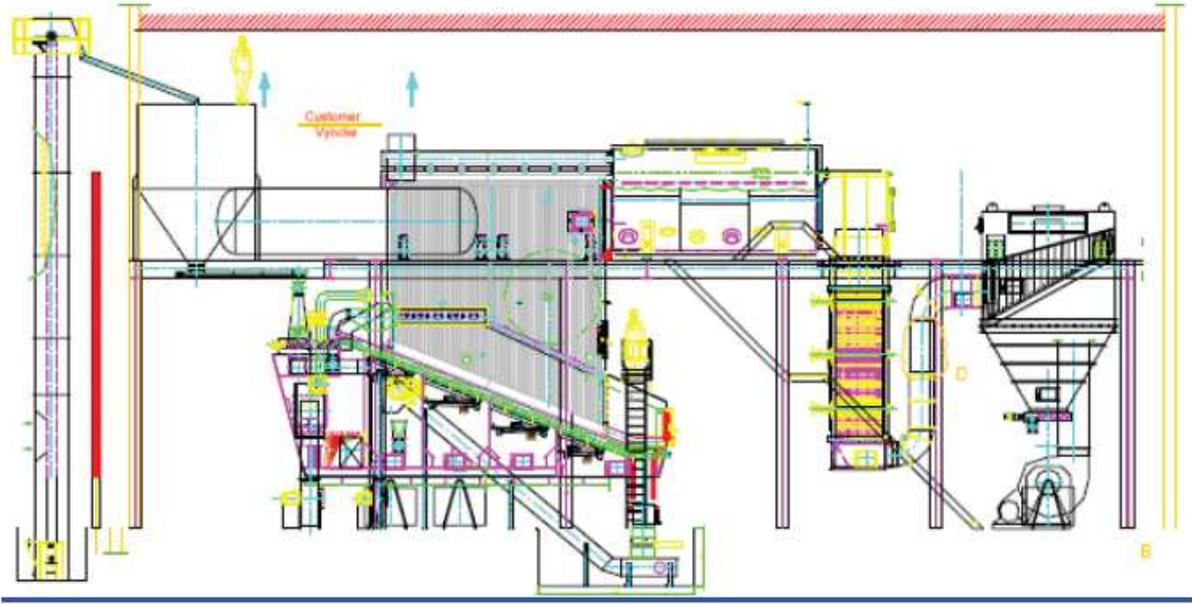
Principal layout of boiler plant (Dynamically air cooled steam grate boiler)
